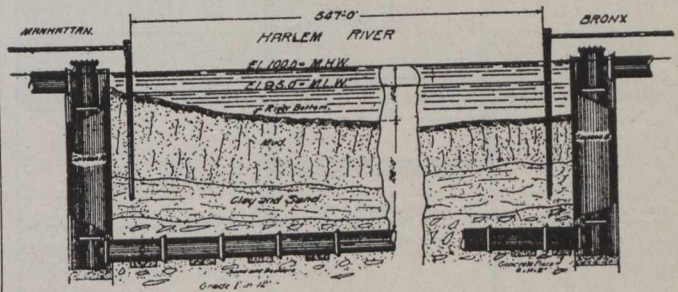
Profile of 48-Inch Harlem River Line Looking West.
